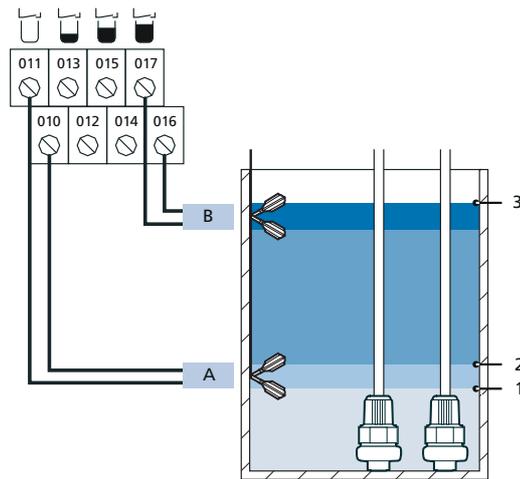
Dual-pump station as stand-by pump: Draining via 2 float switches
